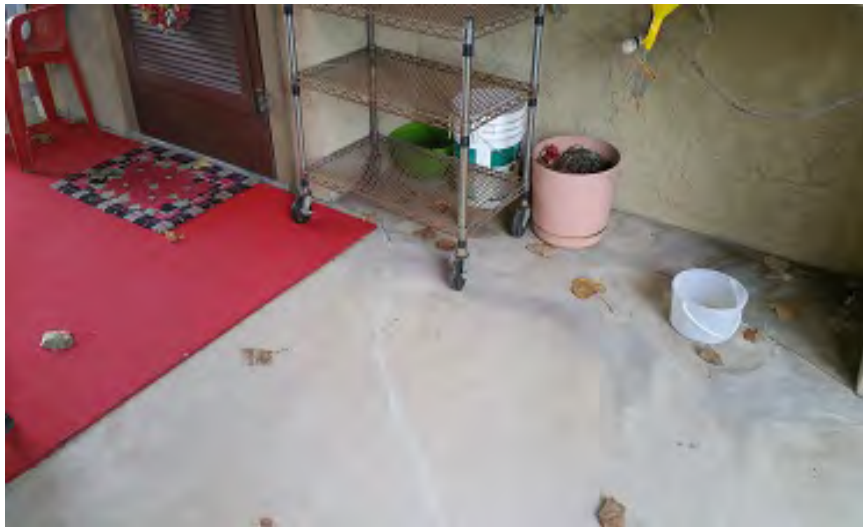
3<sup>rd</sup> Floor: Walkway Crack
